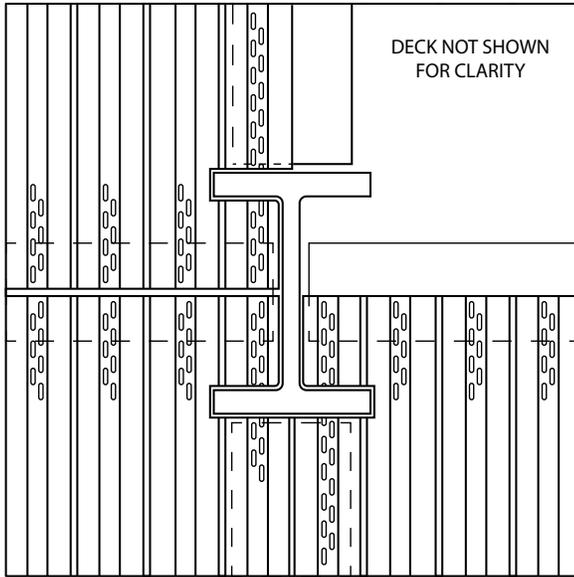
DECK ON OPEN WEB STEEL JOISTS AND OPEN WEB STEEL JOIST GIRDER
